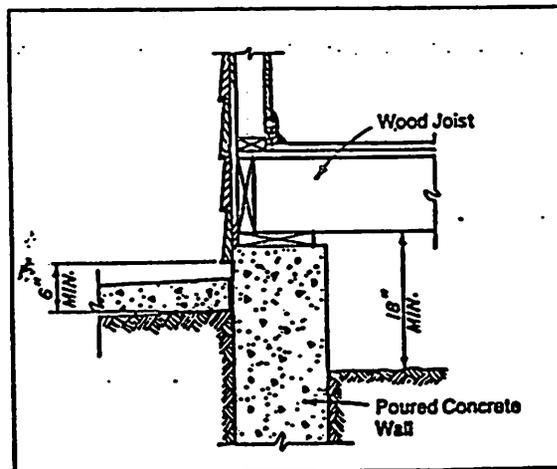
Poured concrete foundation walls or piers that are easily inspected offer complete protection against termite infestation. Proper clearance of eight inches (20 cm) should be provided between the dirt fills and the framing members; also, a clearance of six inches (15 cm) from the wood siding to the fills should be provided. Modified from USDA.
